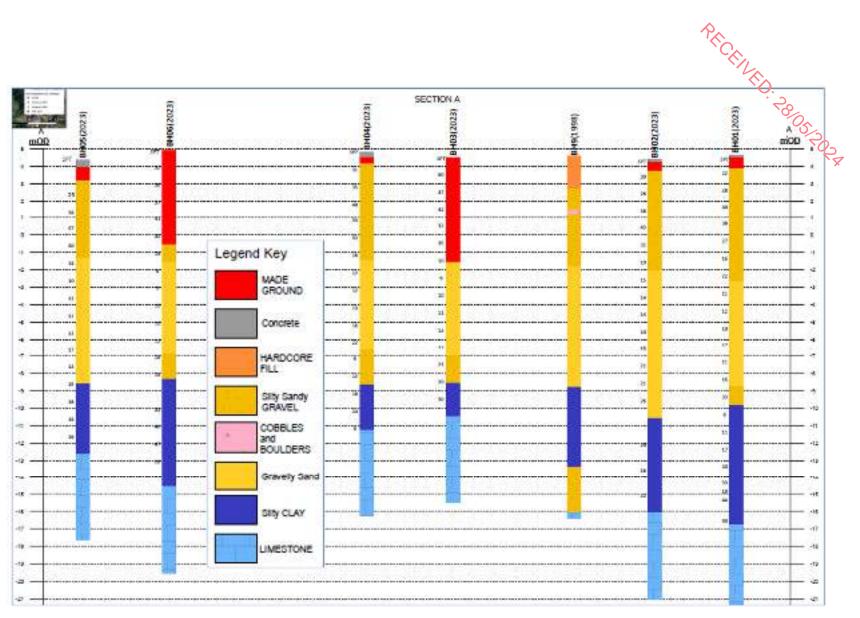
Geological Cross Section of Terrestrial Development Area
